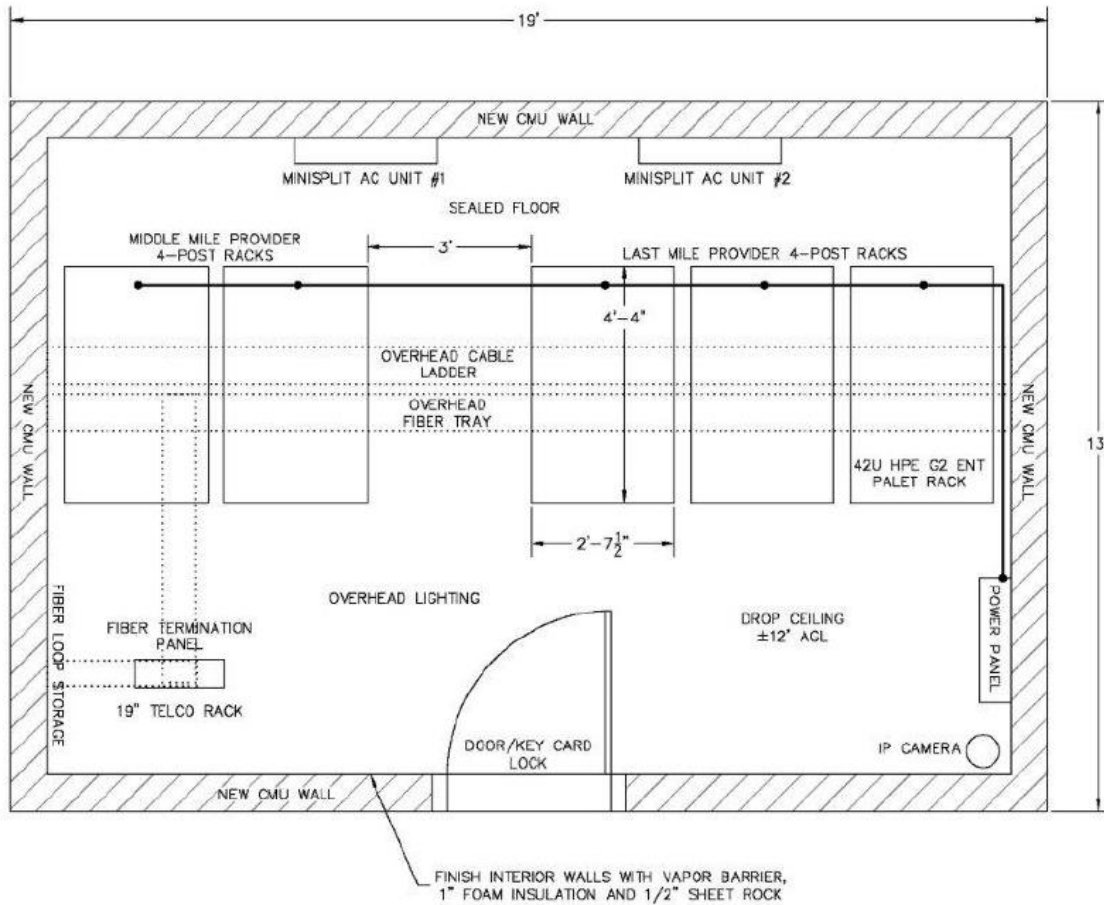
Figure A: Floor plan of the building located at 900 Kiefer Avenue, Fruita Co 81521 with leased premises and authorized access route shown.
